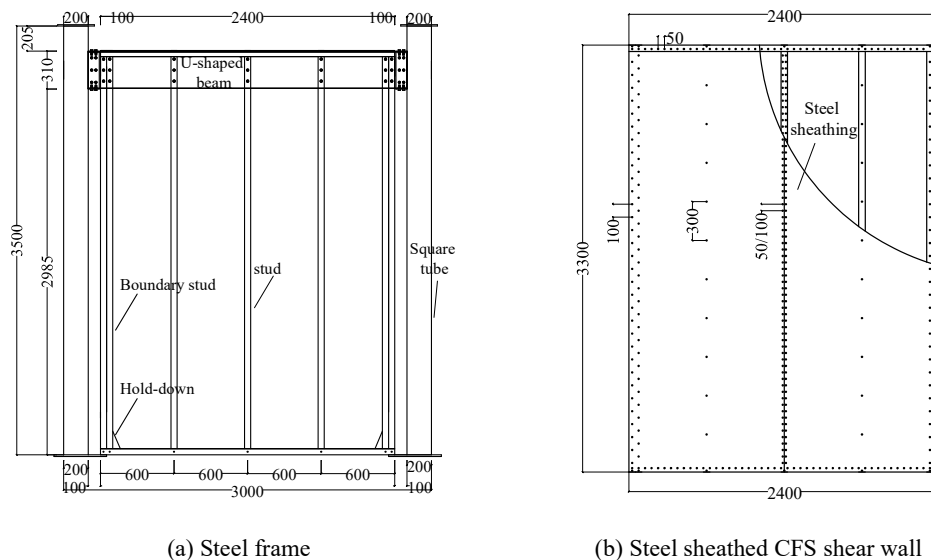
Dimensions of the frame and steel sheathed CFS shear wall.
